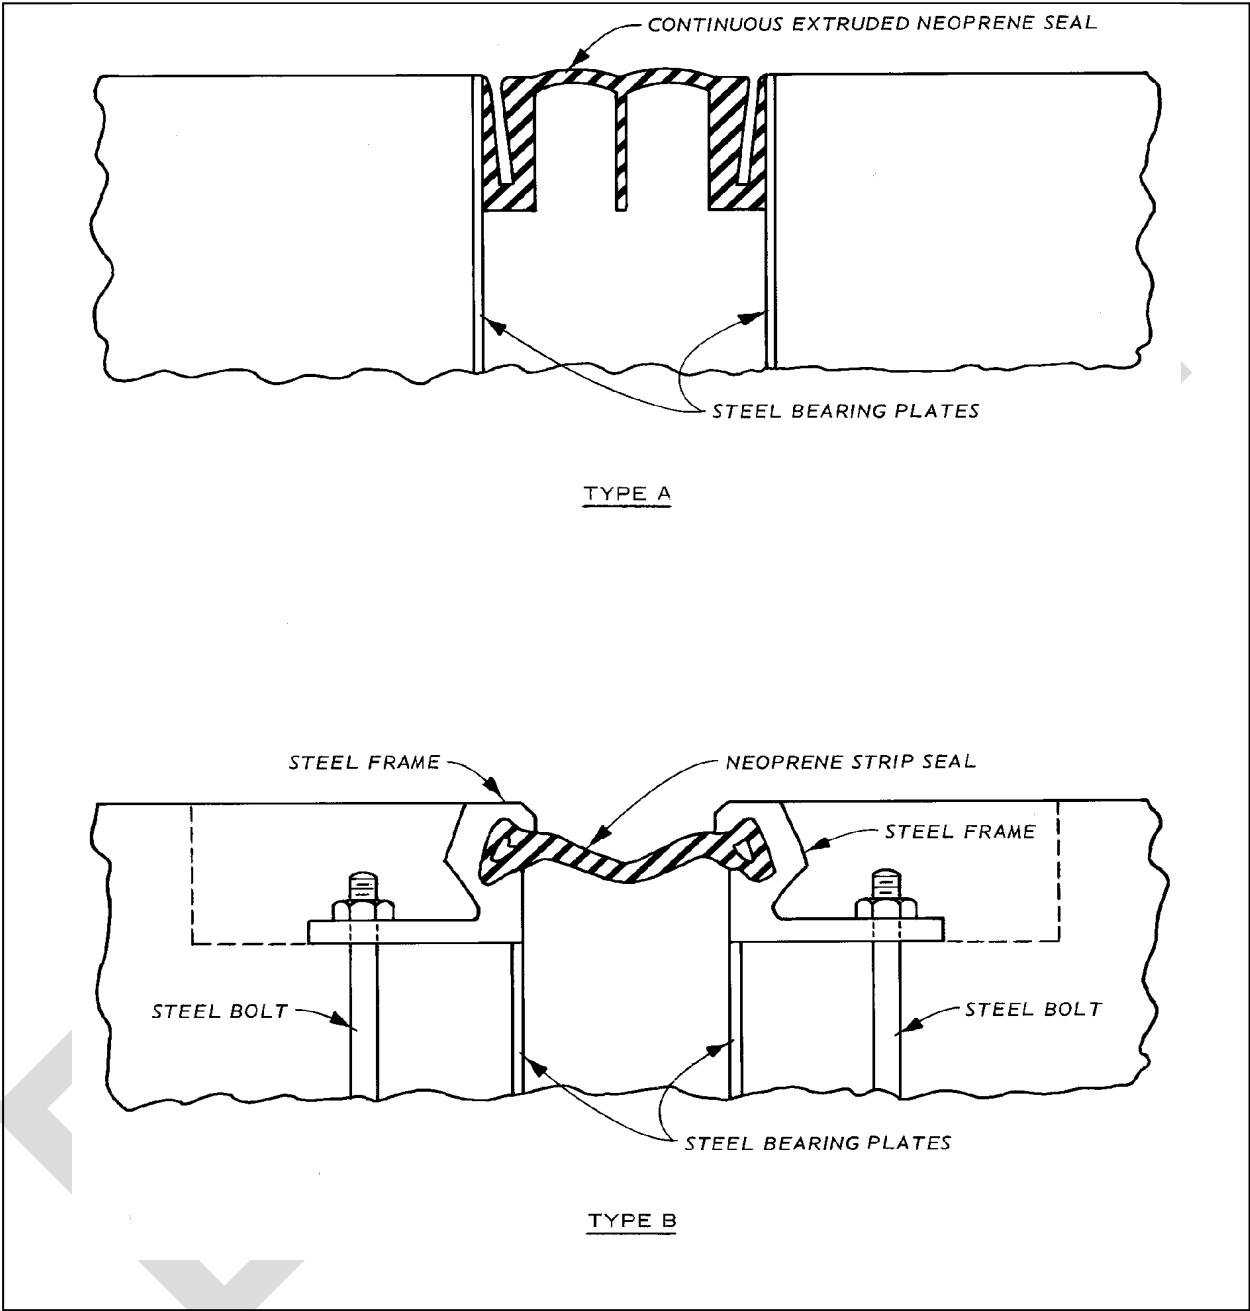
Typical Transverse Joint Seals (Sheet 2 of 3)
